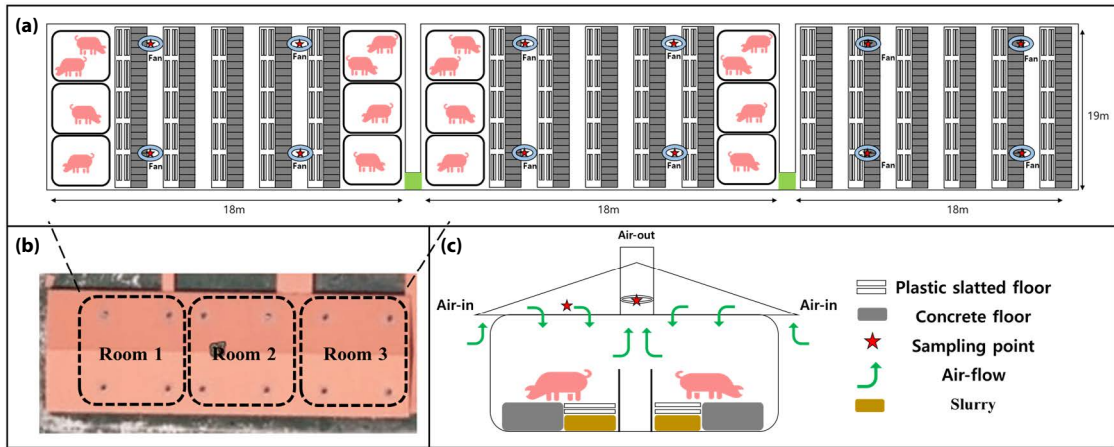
Site description of gestating sow house. (a) floor plan (b) top-view and (c) cross section.
